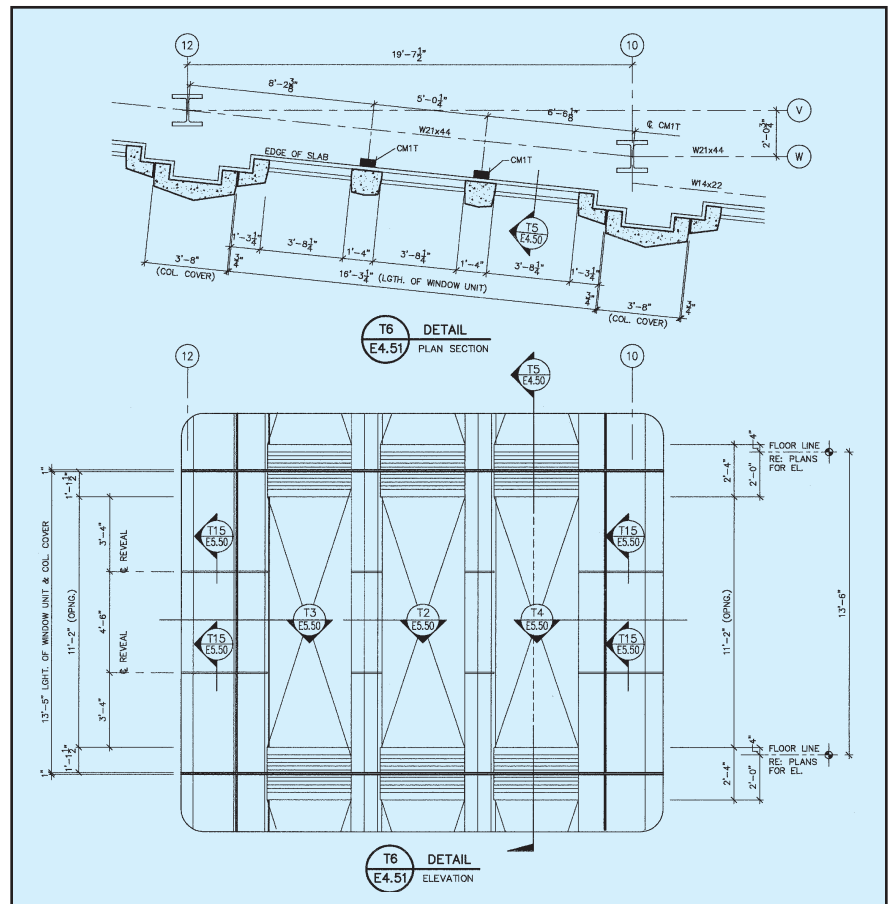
Detail plan and elevation of an architectural window unit panel.
